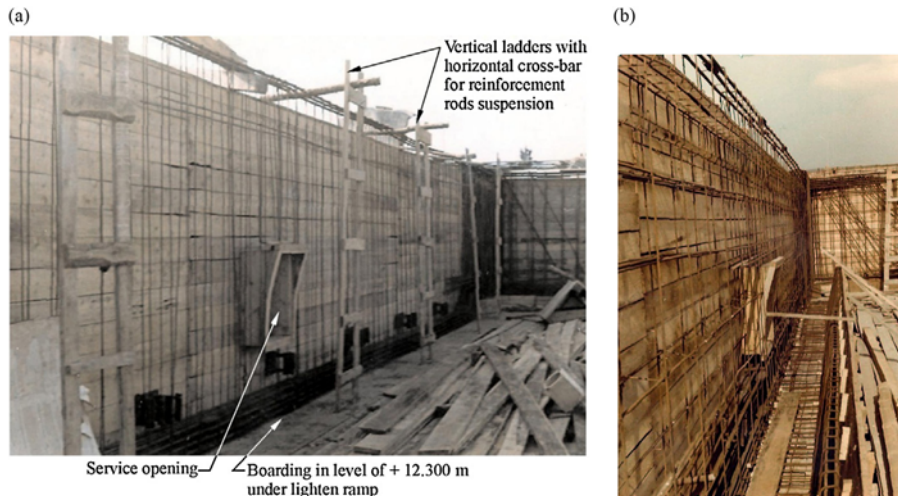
View of the scaffolding of the vertical beam and the vertical ladders with longitudinal bars on the top and suspended stirrups: (a) and (b) with and without reinforcement and a formwork channel lighten ramp.
